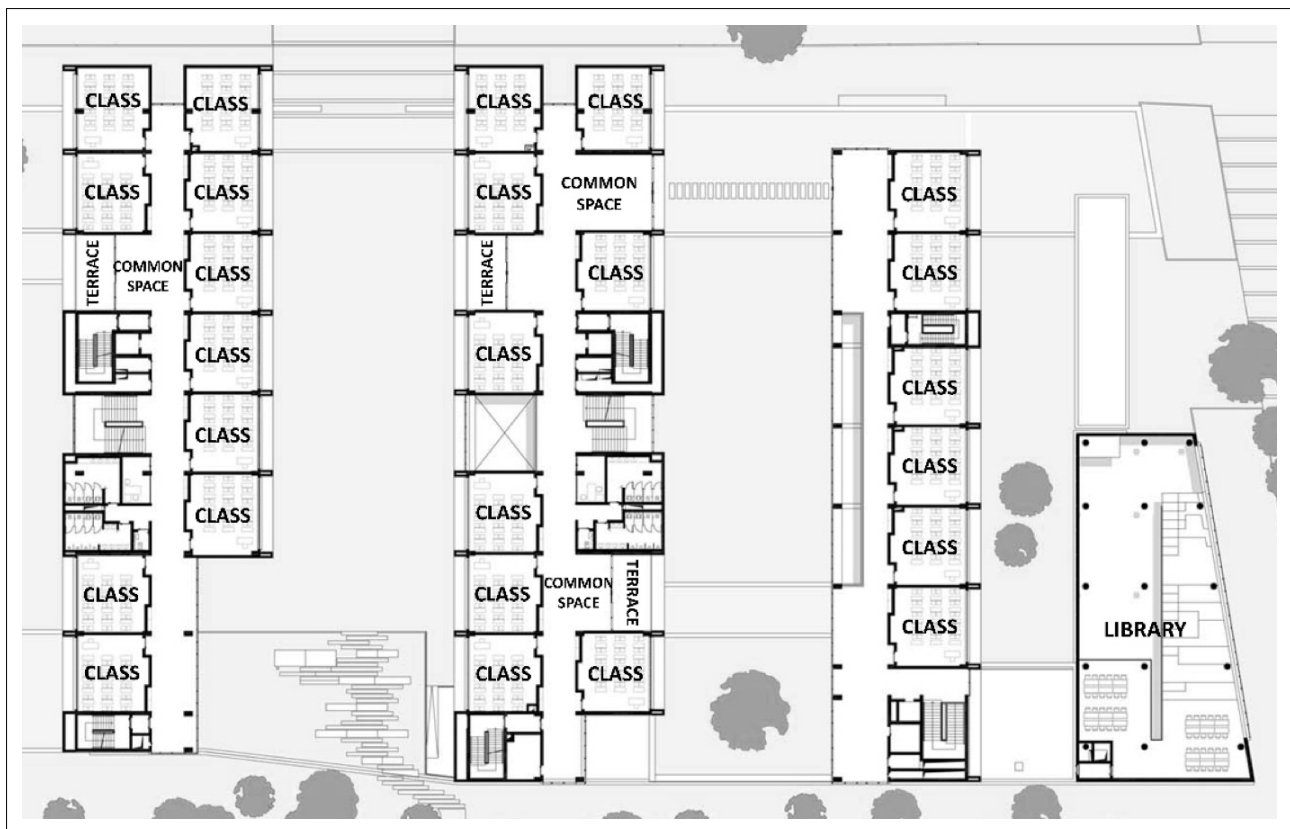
First floor plan (Adapted from Arkitera, 2019).
